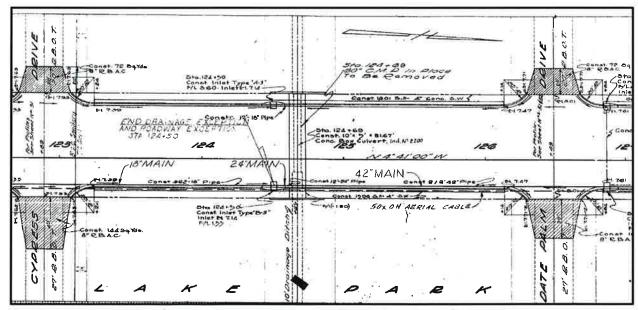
FDOT 1969 Plans for US Highway#1 Drainage Installation along Town of Lake Park
